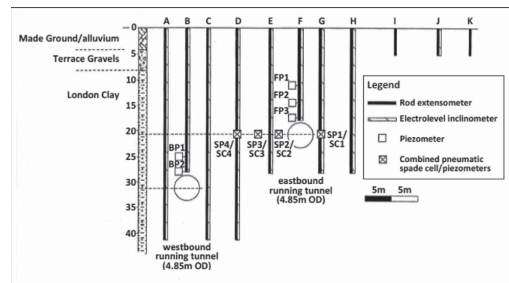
Layout of instrumentation at St. James's Park. (after Nyren, 1998).
